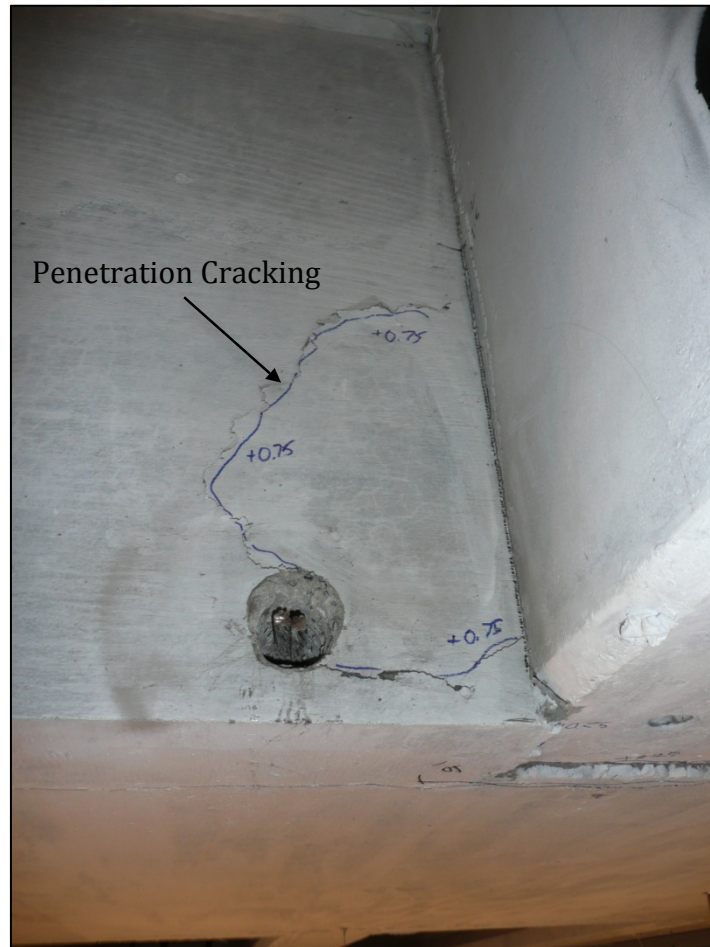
Penetration Cracks on the Face of the Diaphragm on the As-built Connection Side at +0.75 in. Displacement
